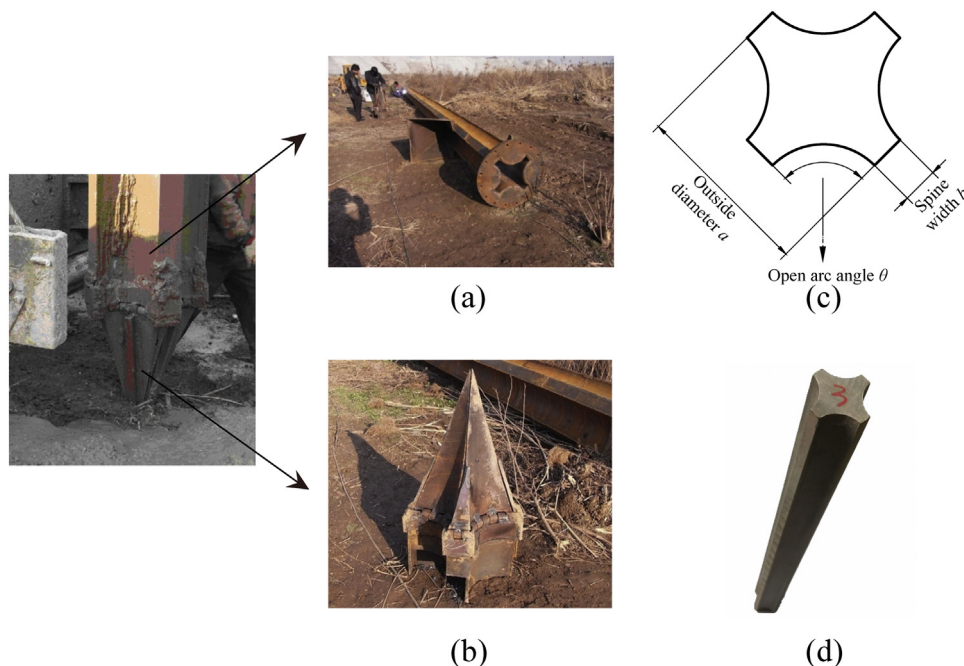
Photographs showing the (a) X-shaped section of the pile mold used to form the XCC pile, (b) the conical shoe with X-shaped cross-section fitted to the pile mold for installation, (c) the geometrical dimensions used to specify the XCC pile, and (d) 3D printed model pile used in the shake table experiments.
